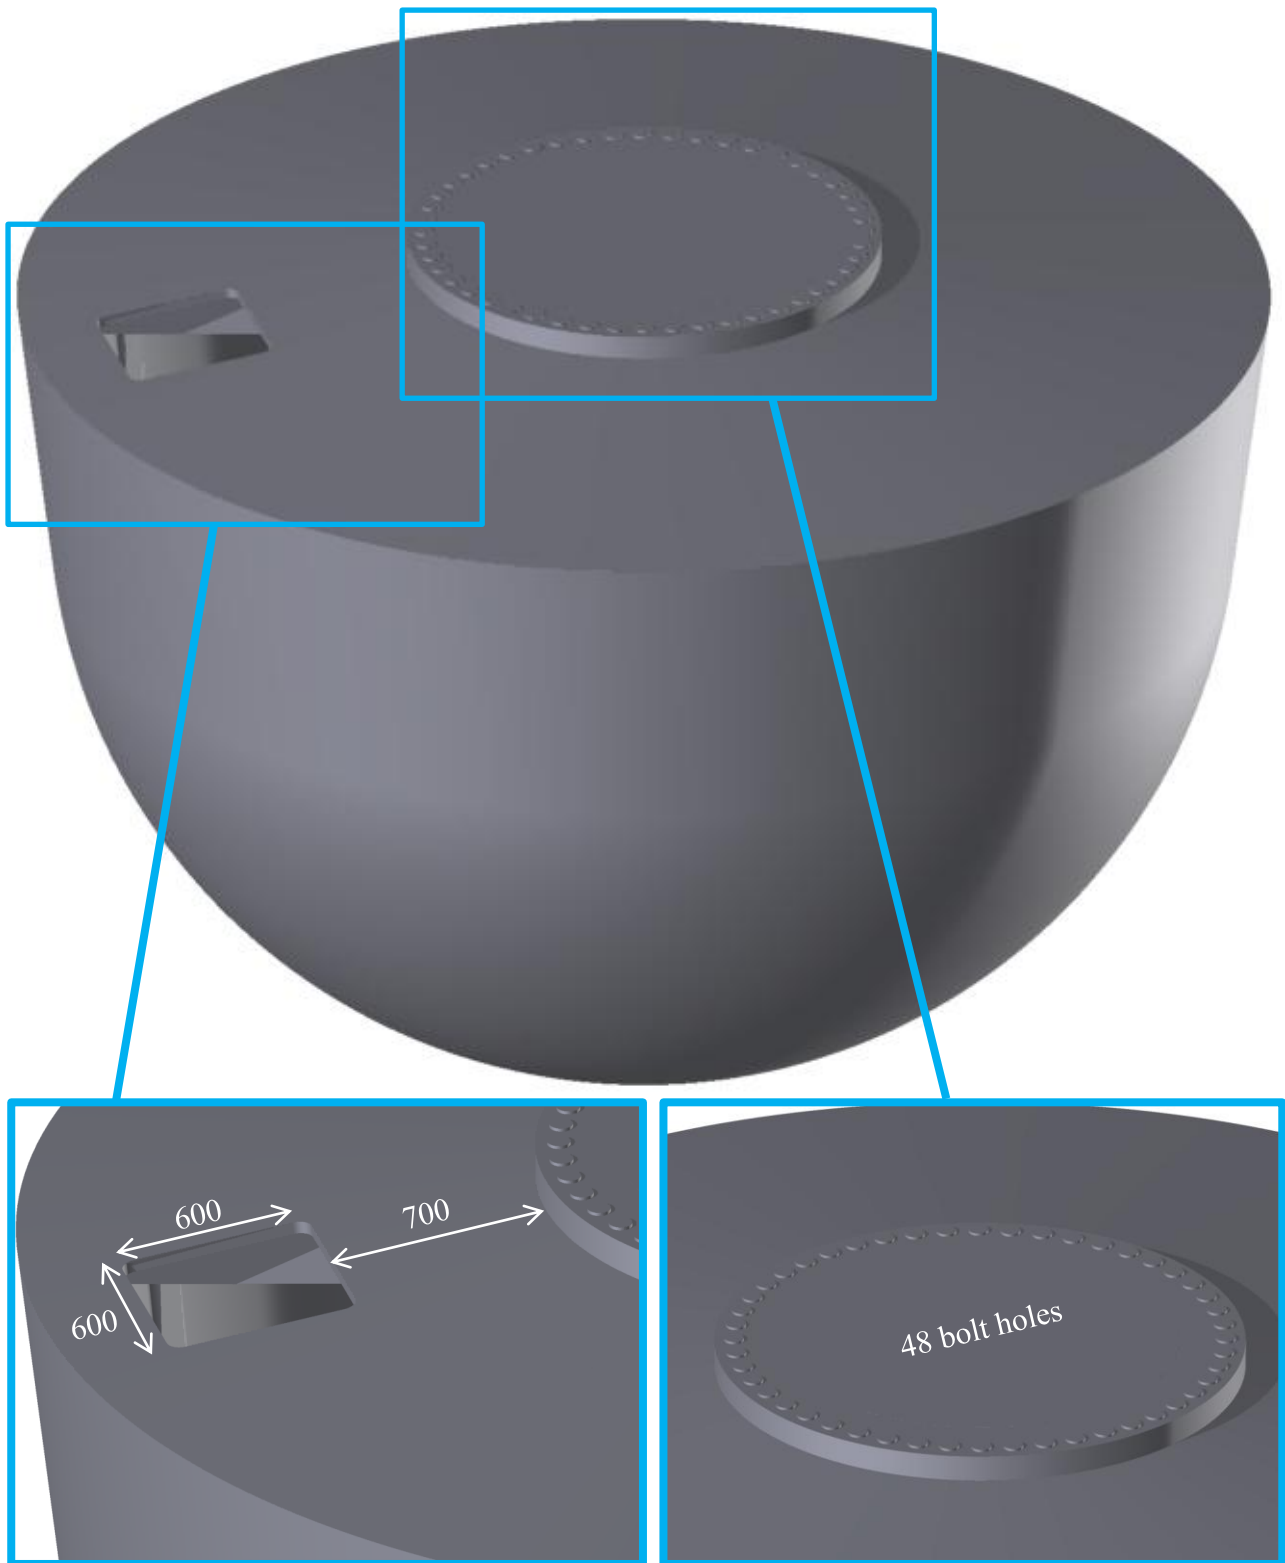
Hatch (left), Transition flange with bolts (right) [mm].
